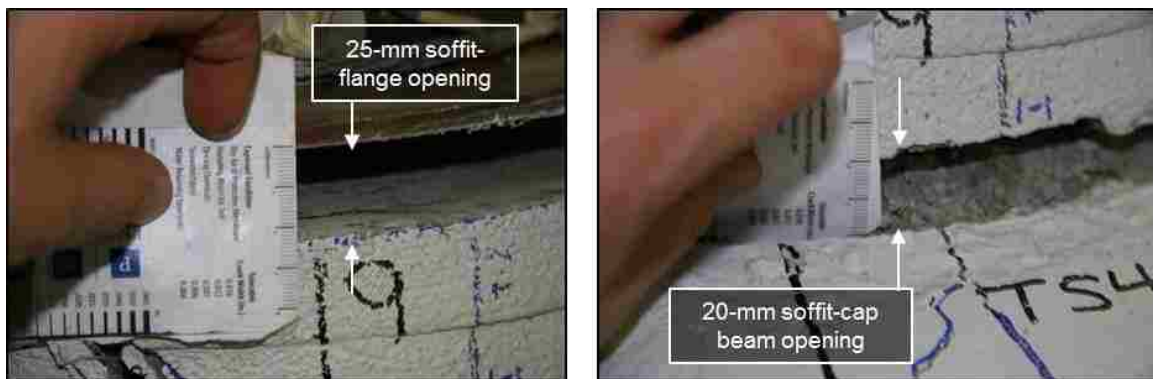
WRC North soffit cracking at 7.08% drift South
